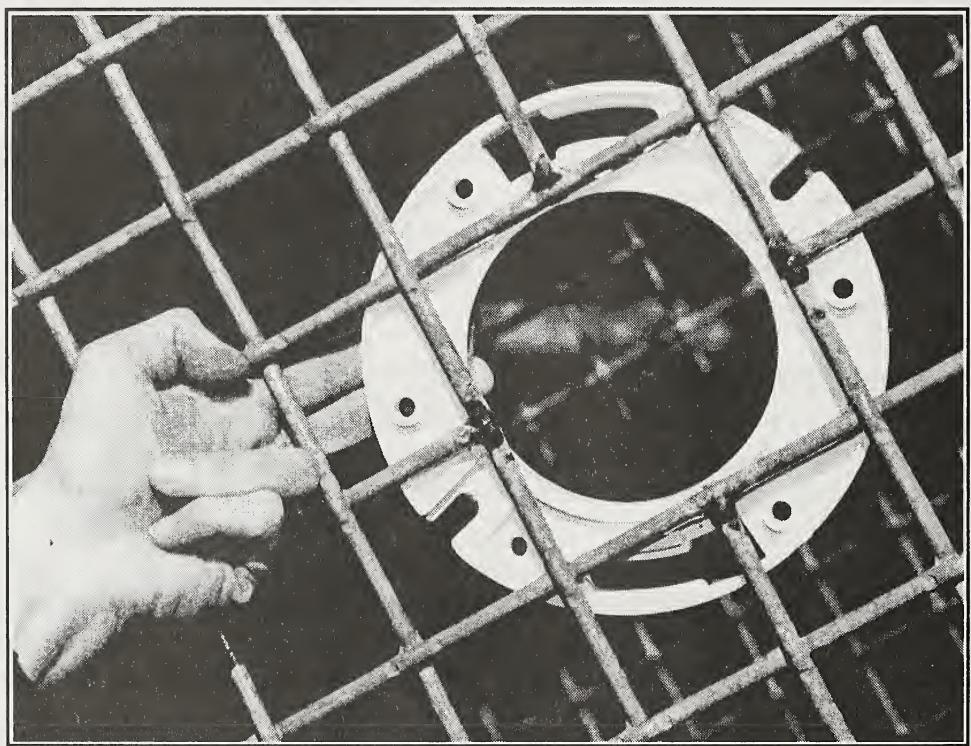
Small part of caging cut and first PVC flange placed inside. (Photo by Cathy Burkey)
